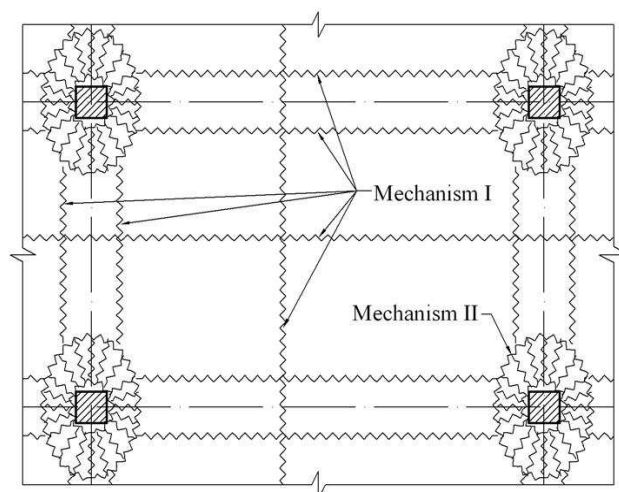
Crack patterns in elevated concrete slabs
